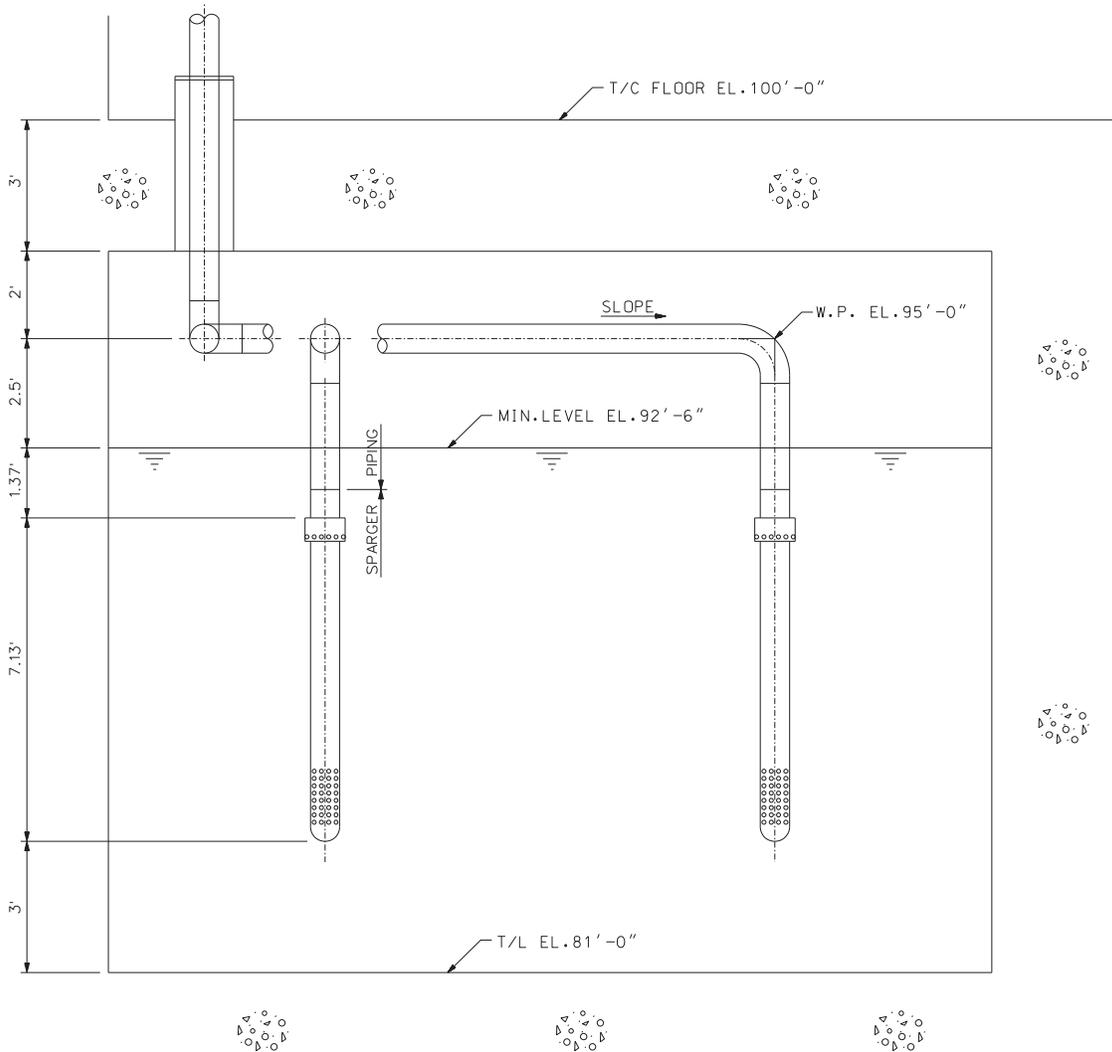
Typical Header Piping and Sparger in IRWST
